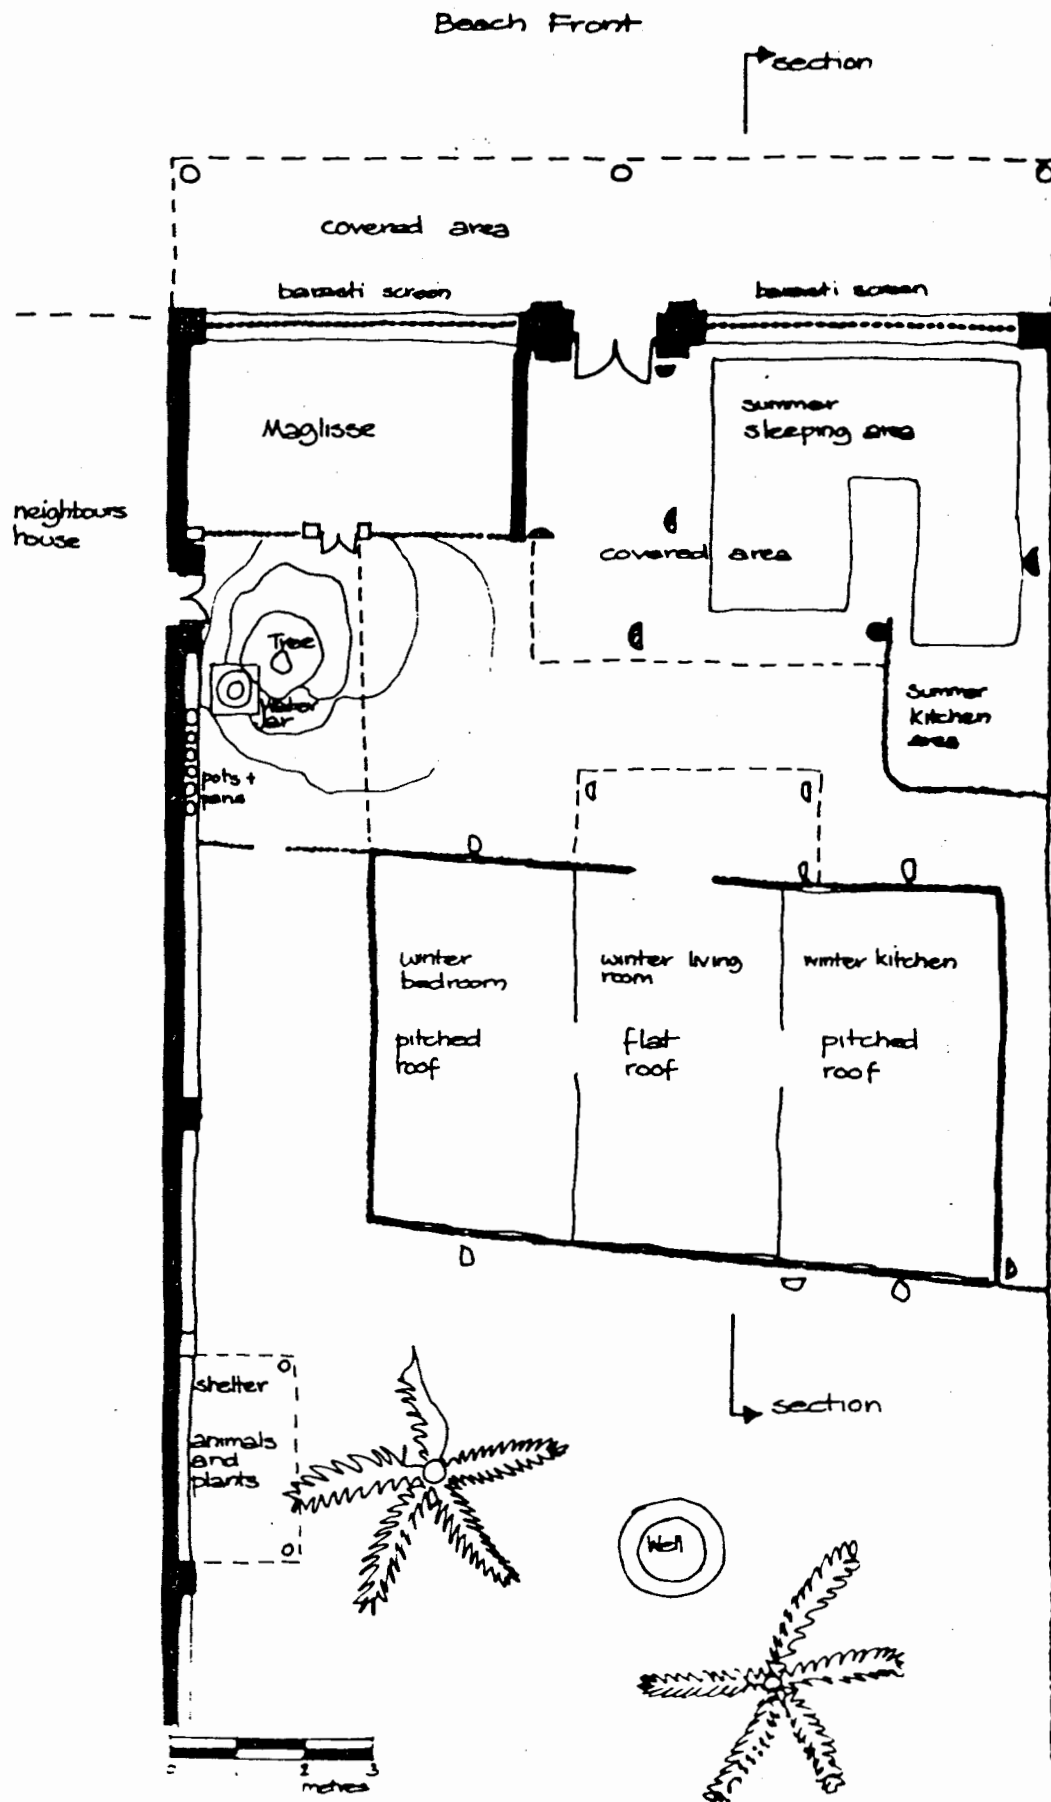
House of Mohic Abdullin Beach Front - Sohar Plan
